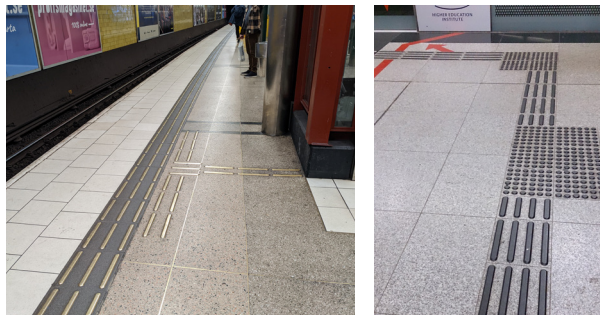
Subway stations in Stockholm Tunnelbana (left) and Singapore MRT (right) feature low-profile tactile wayfinding bars with consistent layouts.
